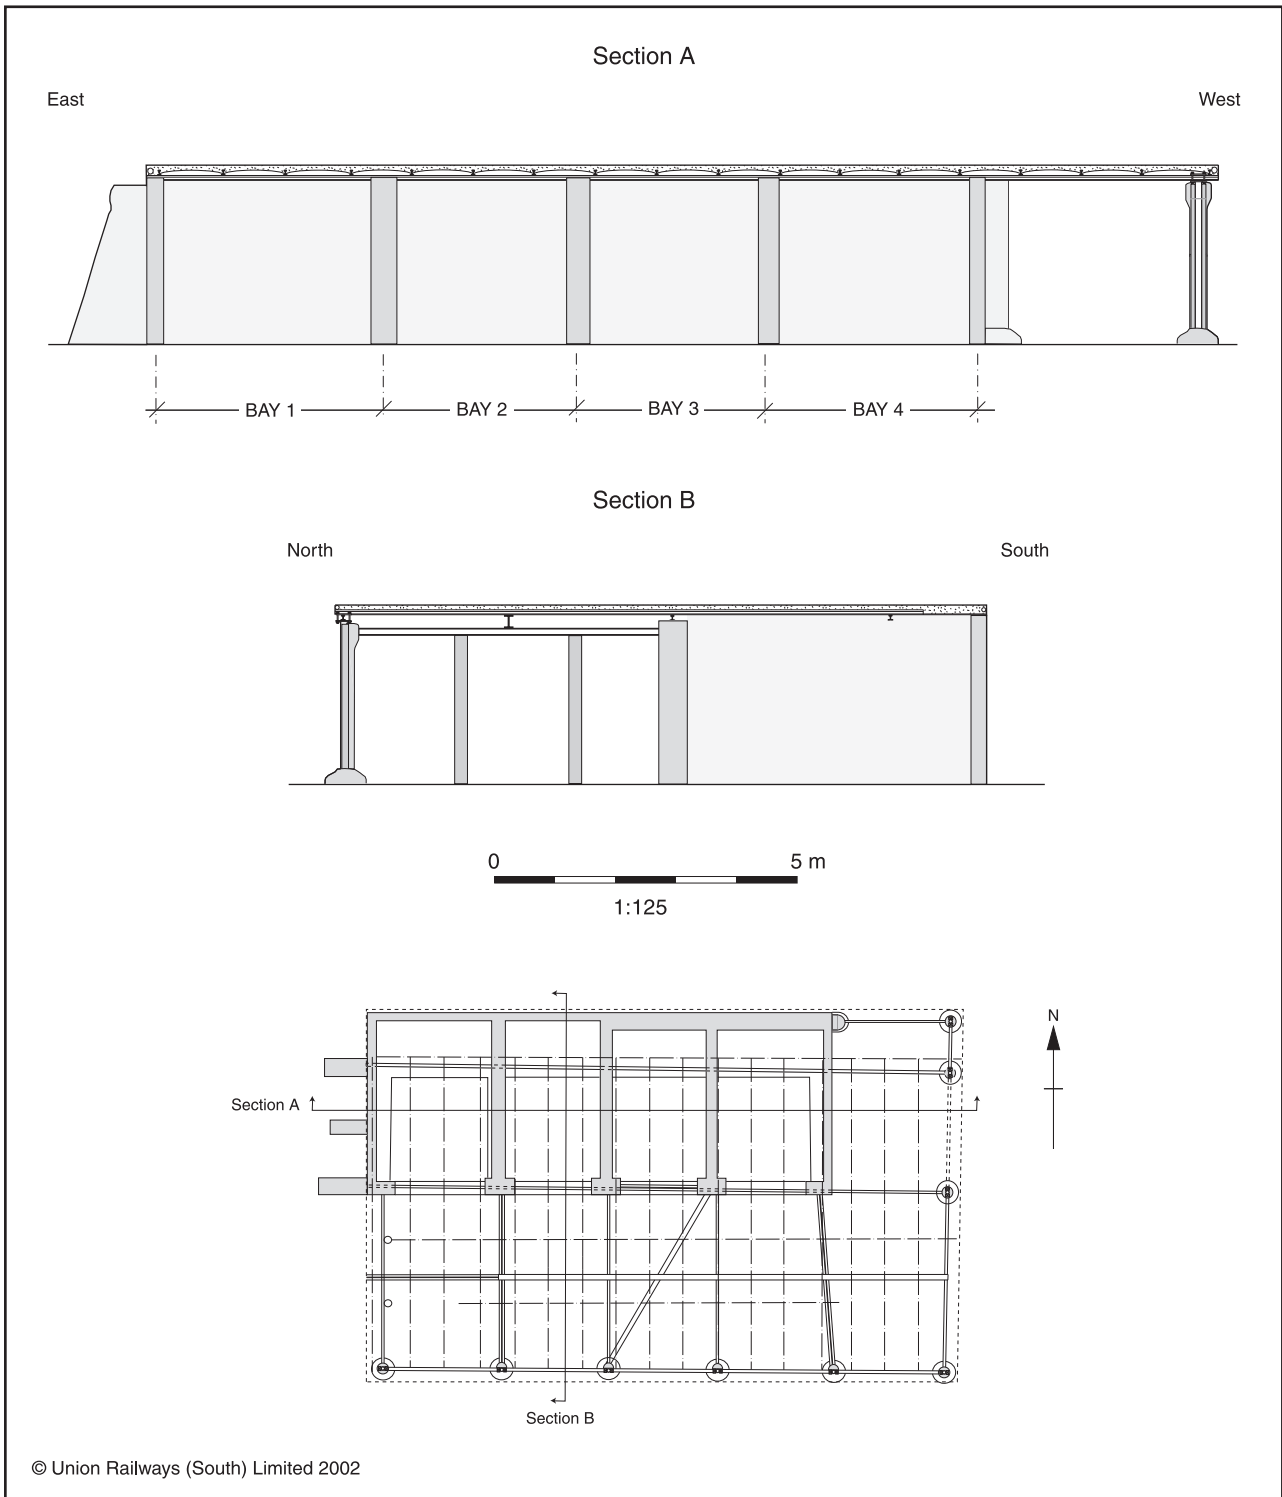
Westhanger Fairmead Farm: plan and sections of barn
